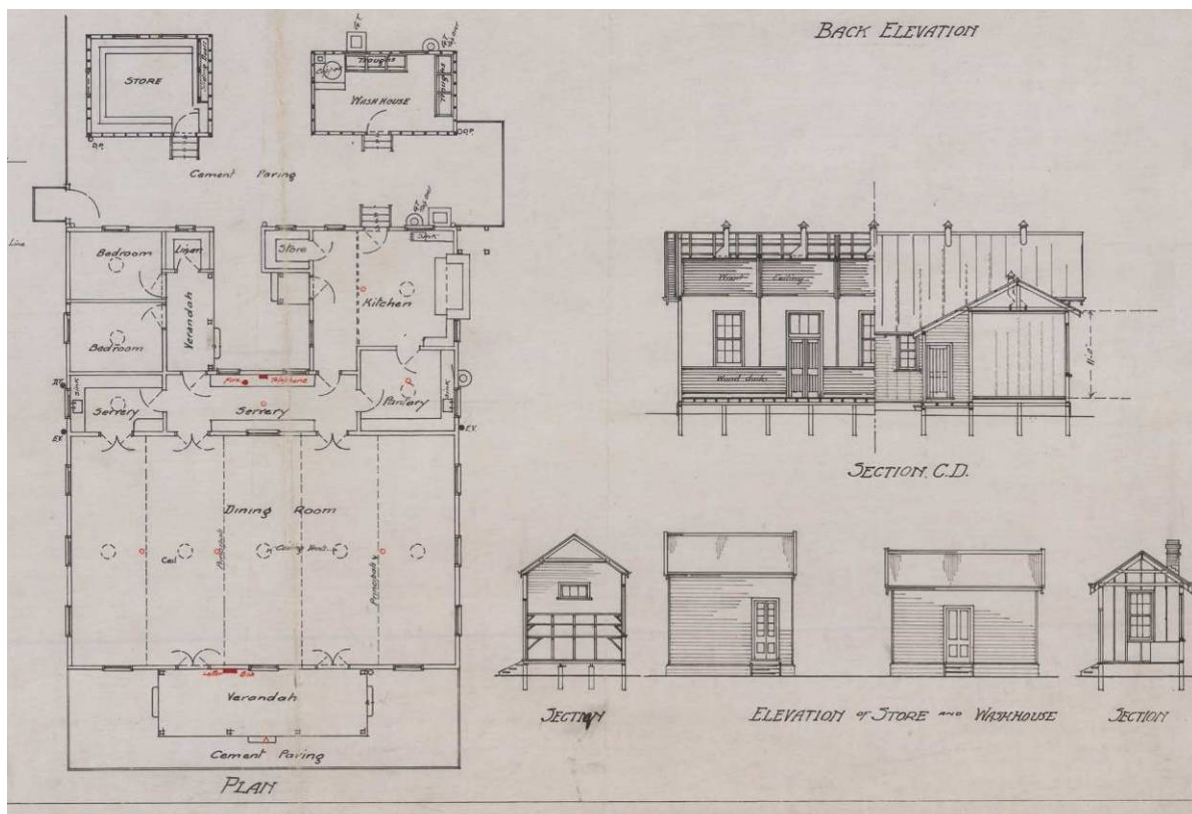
Detail of Quarantine Station, Point Nepean - Dining room and Kitchen Block. The store (Building 19) is in the top left corner. Source: National Archives of Australia.
